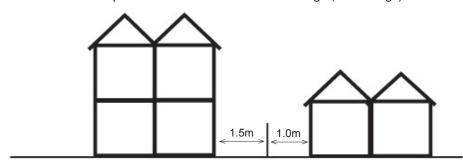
Urban residential development - minimum building setbacks to side boundary
